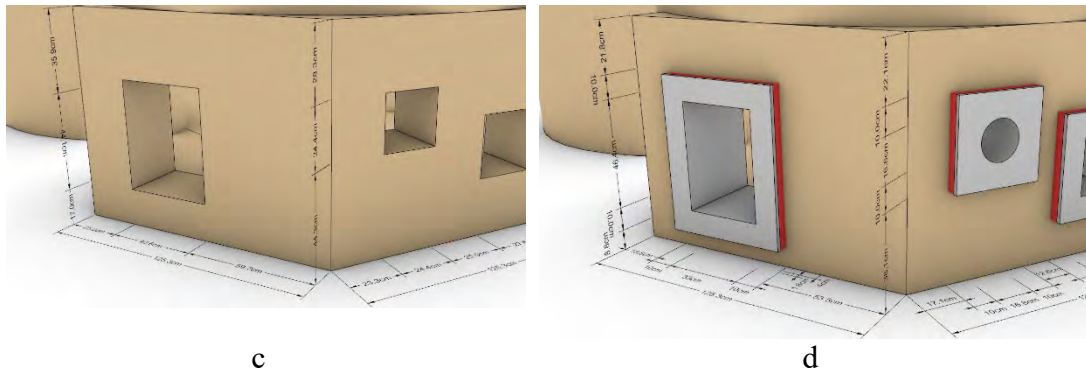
Location of exterior penetrations designed for Construction Level 3 in plan (a and b) and in elevation (c and d).
